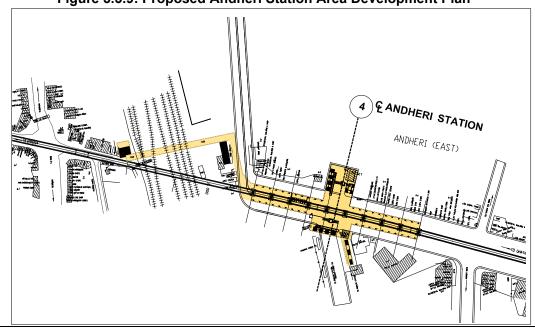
Proposed Andheri Station Area Development Plan
